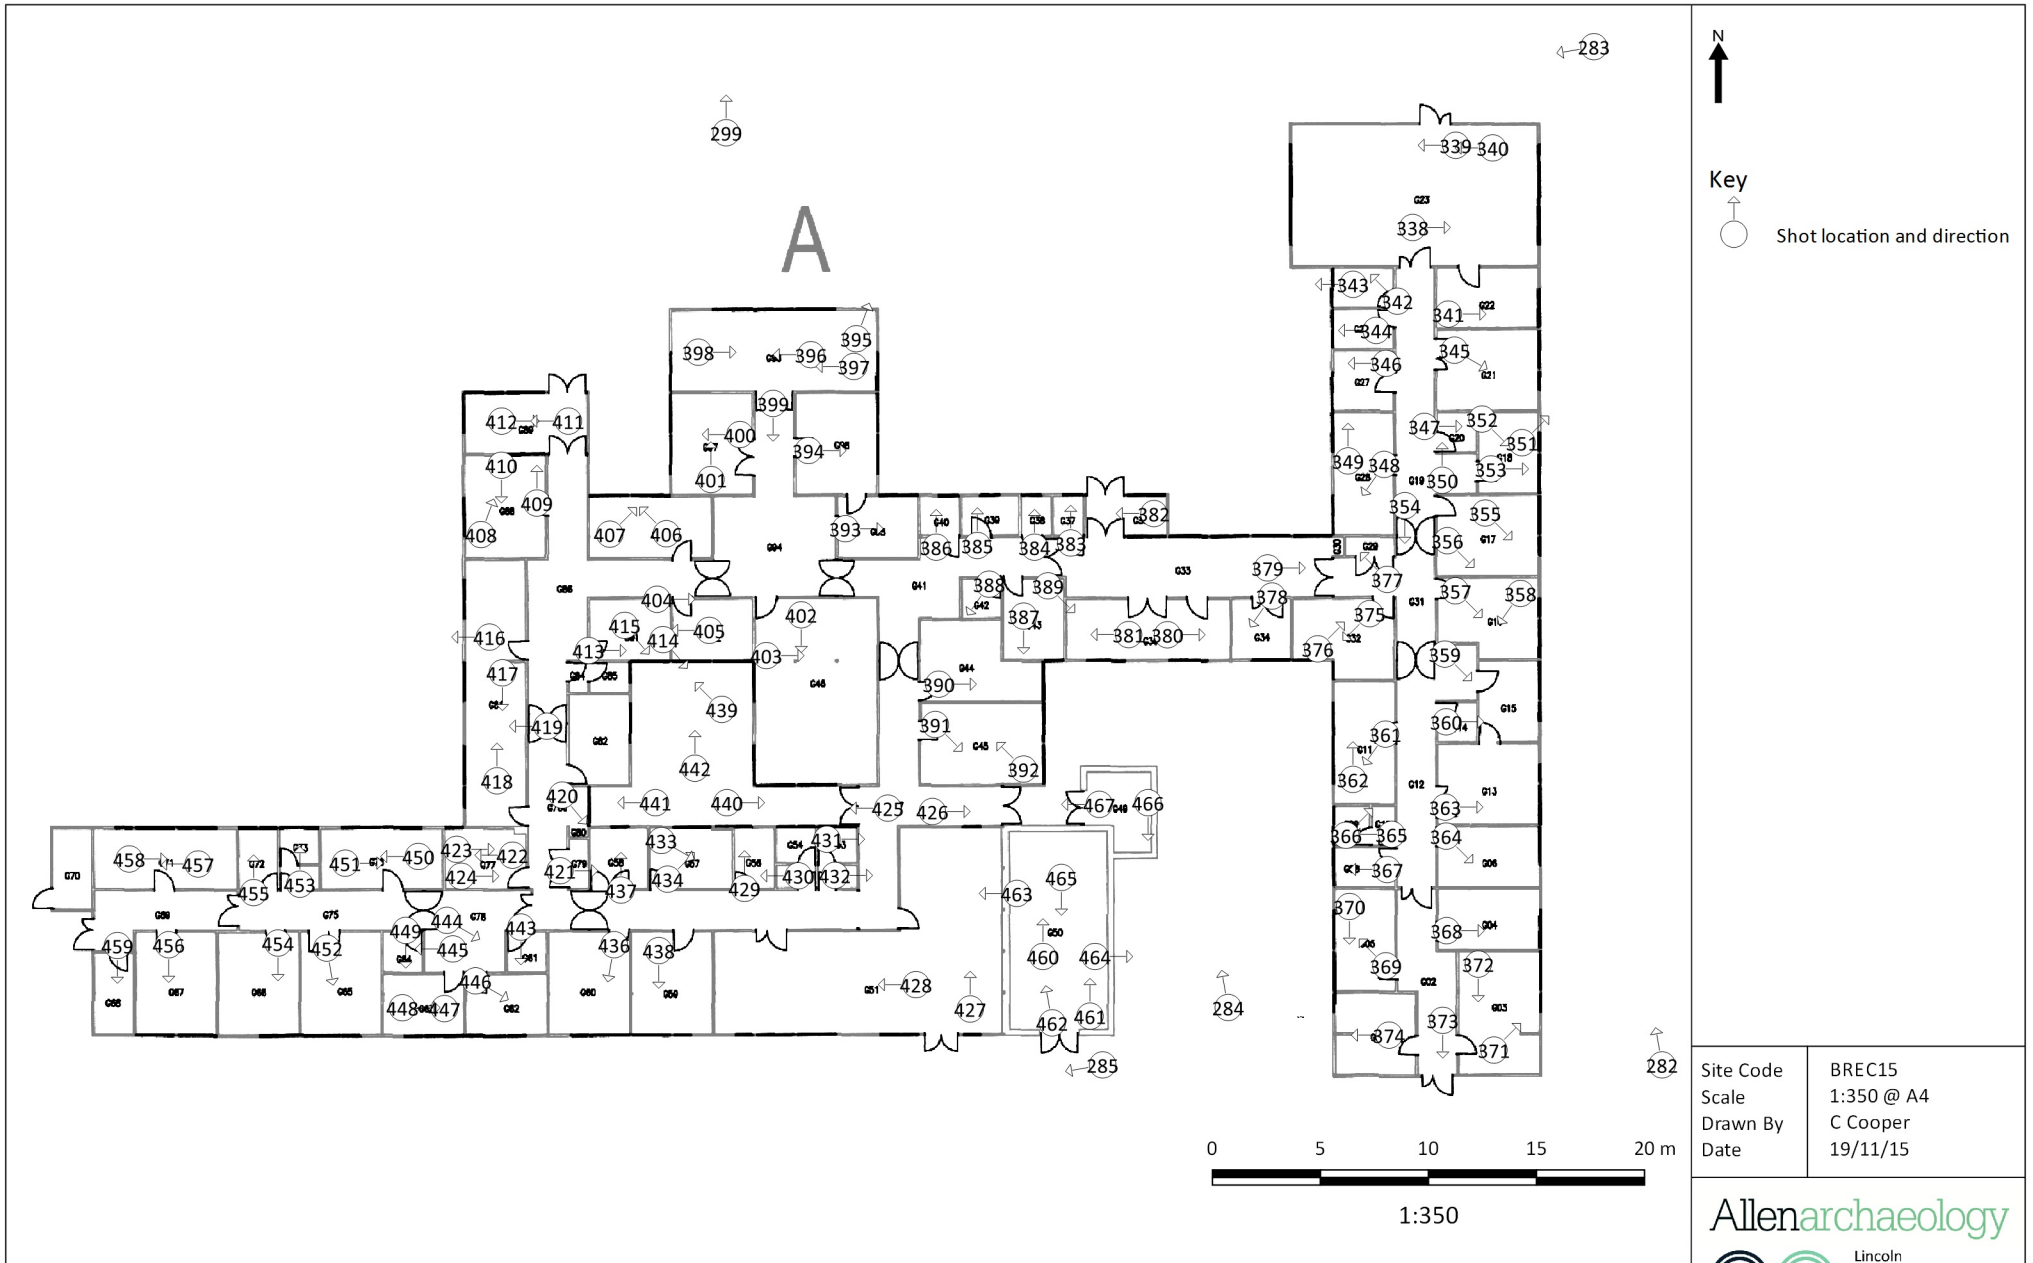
Ashby House, plan of ground floor (Base map provided by client)
